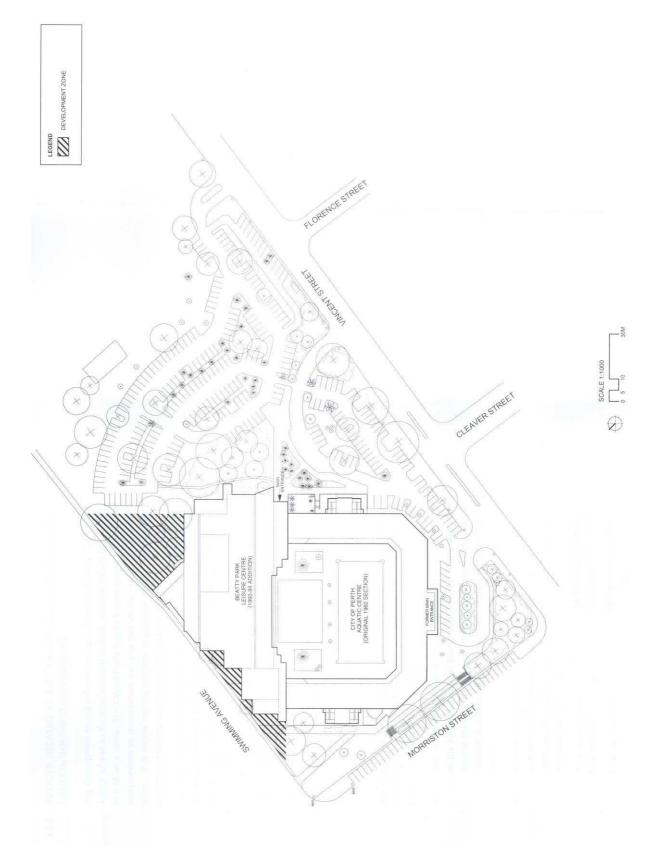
Beatty Park Leisure Centre – Site Plan (Possible Future Development Zones).
